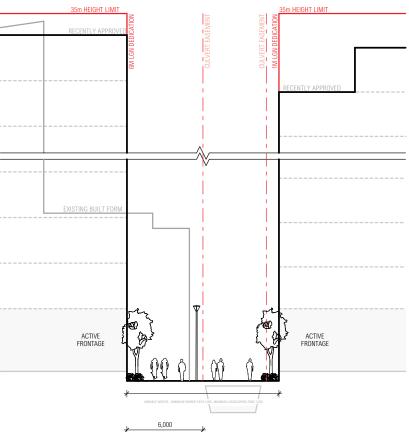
Indicative street section – Mandible Street, North Alexandria
